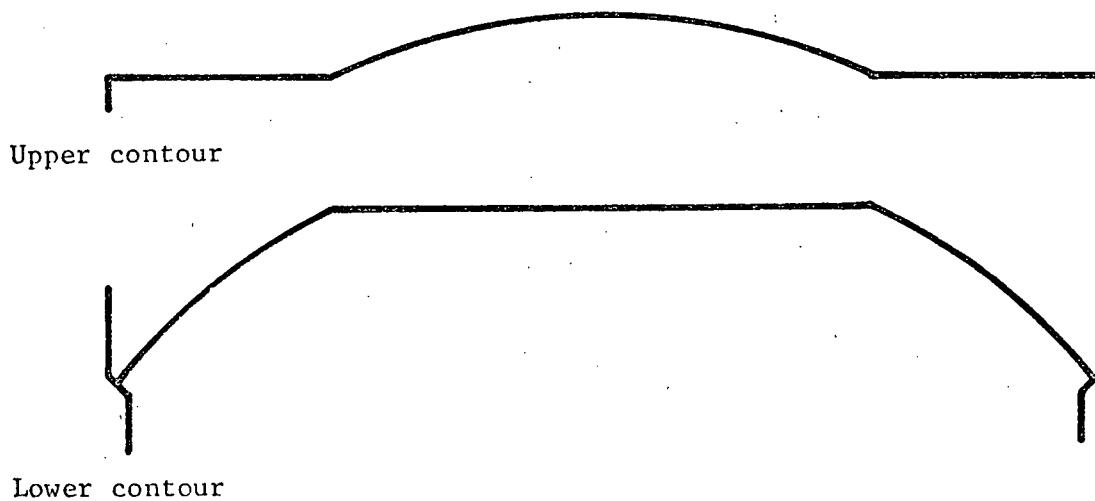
Upper and lower view of a bridge with a half-sunk roadway.
